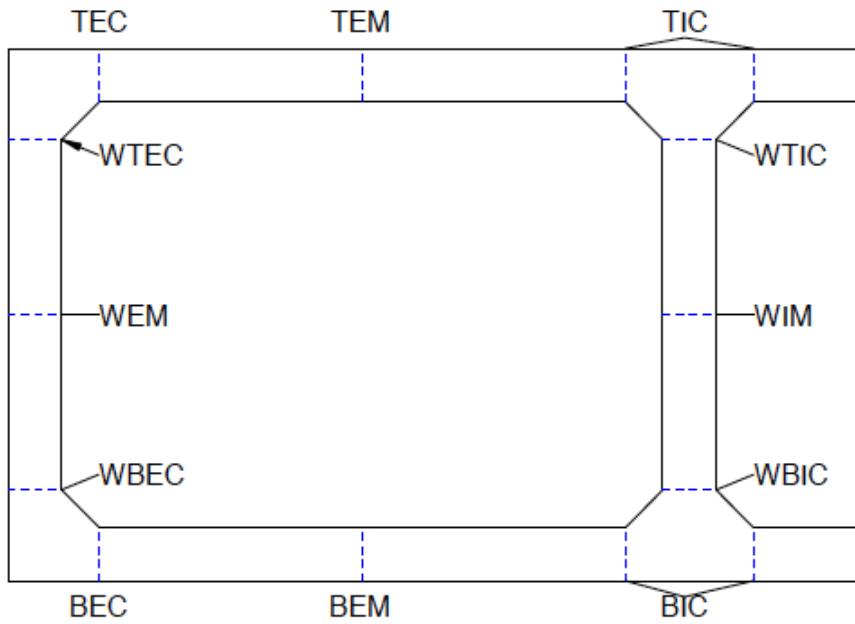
Critical Flexure Section for Box Culverts (Culvert Rating Guide, TxDOT)
